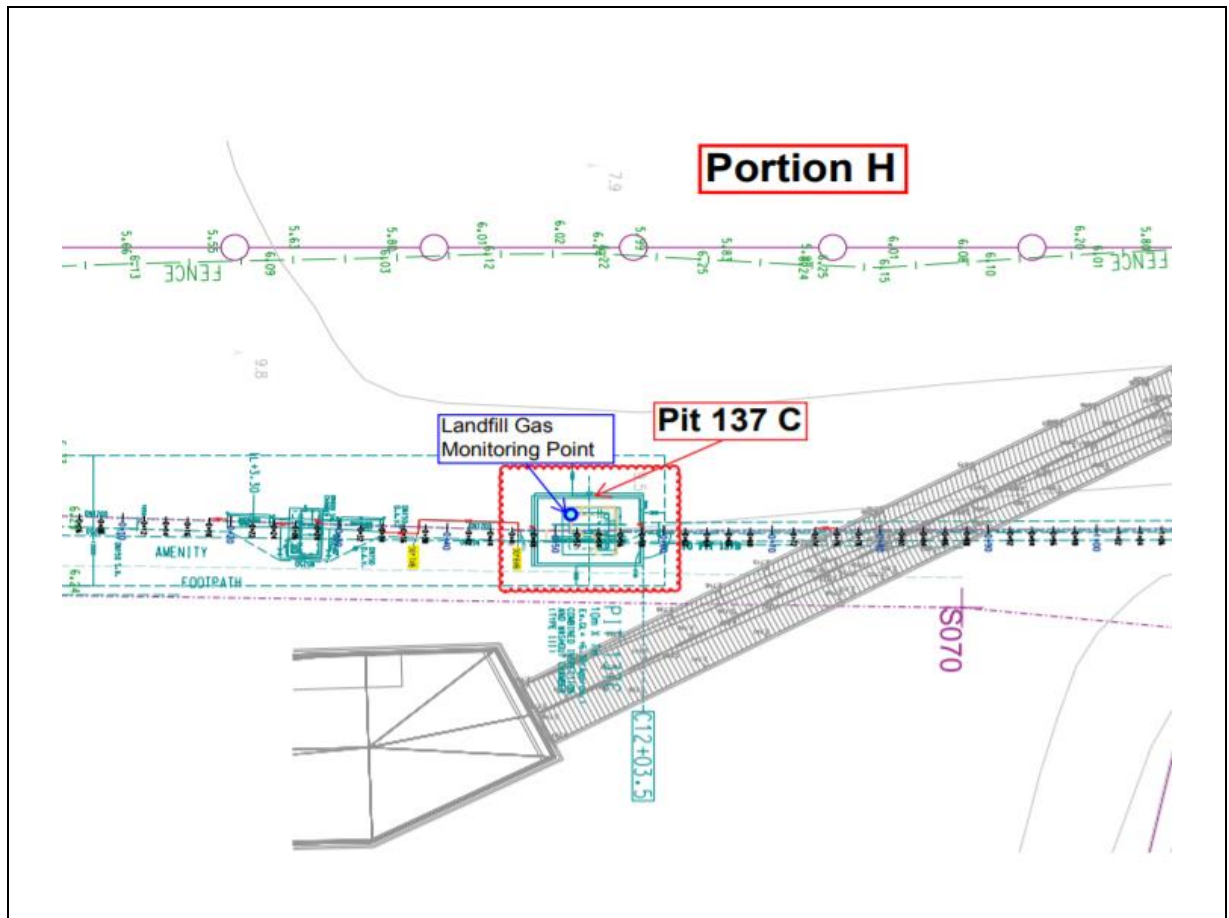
Monitoring Location – Pit 137C (137 Pit C)
